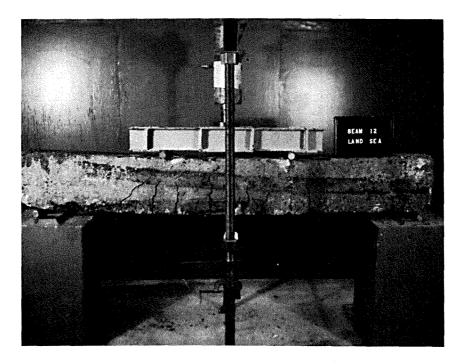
Failure condition of beam not experiencing reinforcement pullout
